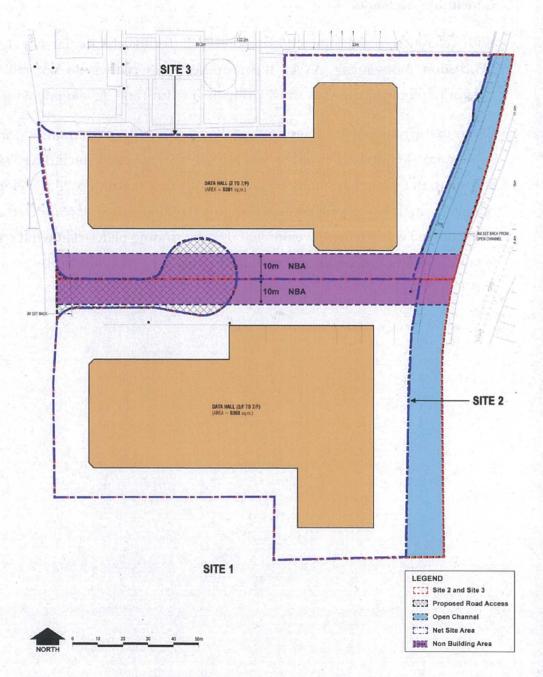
Layout Plans of Proposed Data Centres (Typical Floor) and Proposed 20m-wide NBA
